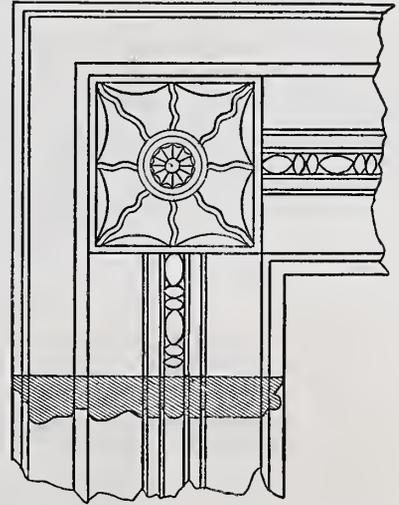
Upper Corner of First Story Architrave.—Scale, 3 Inches to the Foot.
